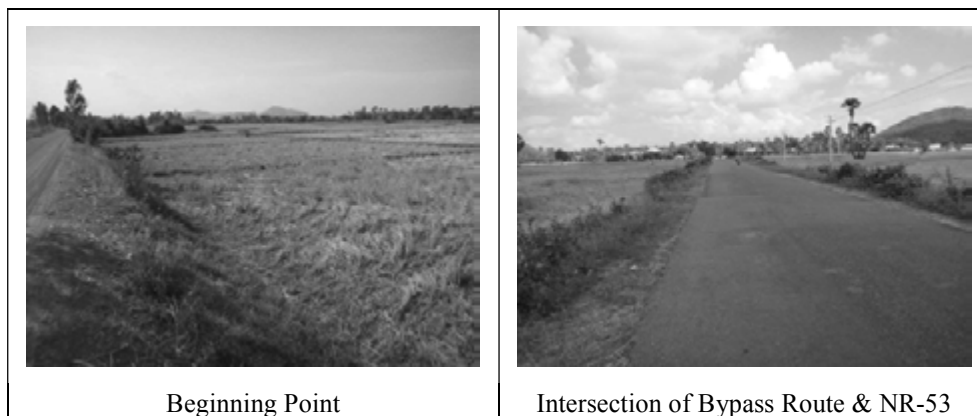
Photo at Kampong Chhnang Bypass Route
